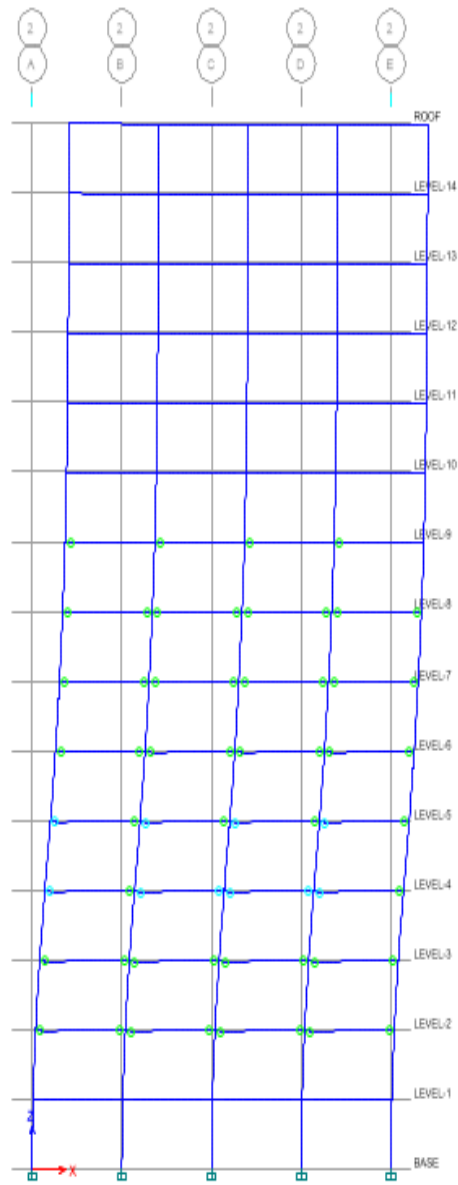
2D view of plastic hinge formation at performance point for 15-storied RC Cracked section building
